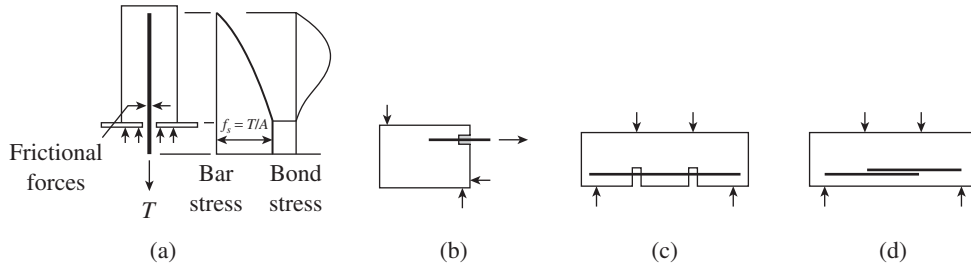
Test methods (a) Pull-out specimen (b) Beam-end specimen (c) Beam-anchorage specimen (d) Splice specimen
